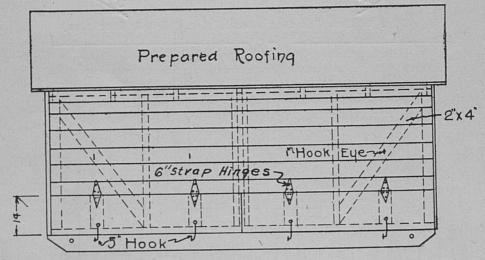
Two Pen Hog House, plan C 6-74-1, rear elevation.
